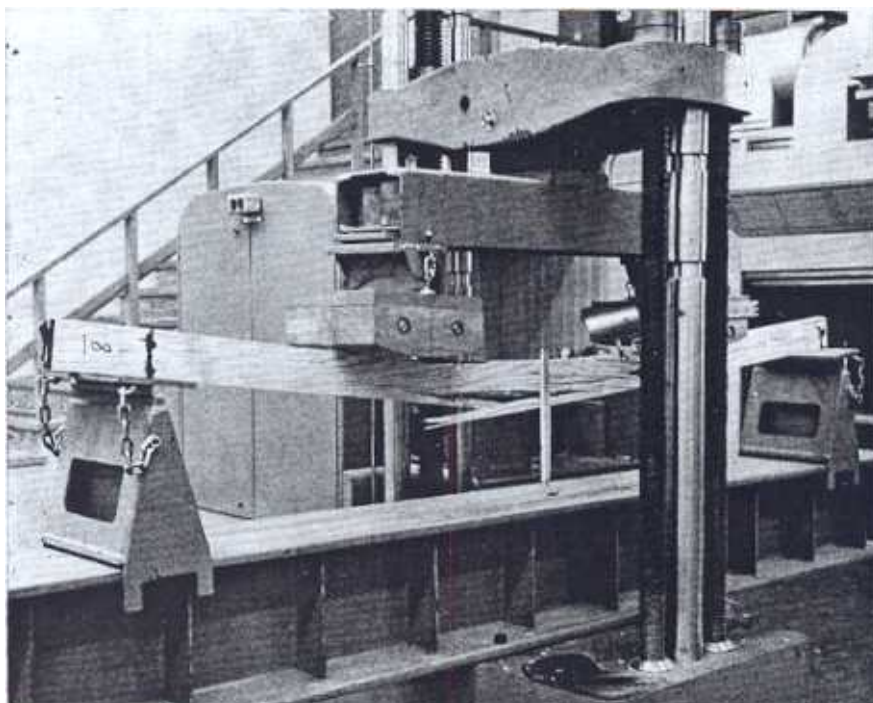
Setup for testing 2 by 4's in edgewise bending over 90-inch span with two load points 40 inches apart at midspan. Tension failure of laminated 2 by 4's was typical.
